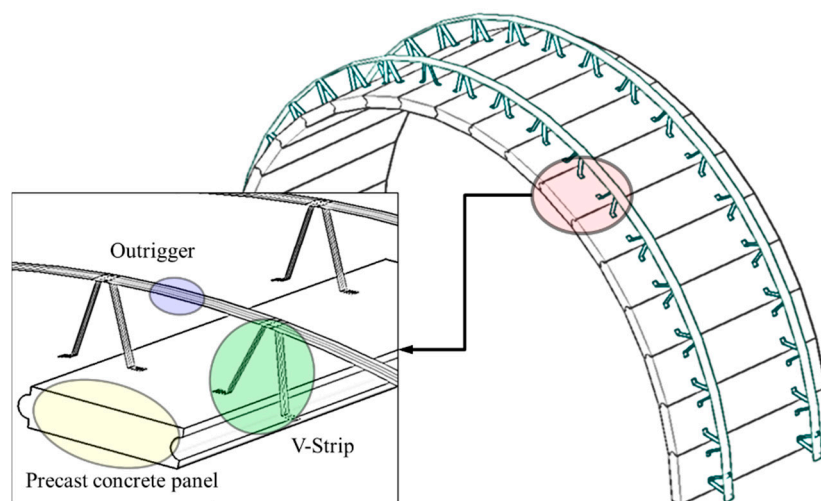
Precast, panel-segmented arch bridge with outriggers.
